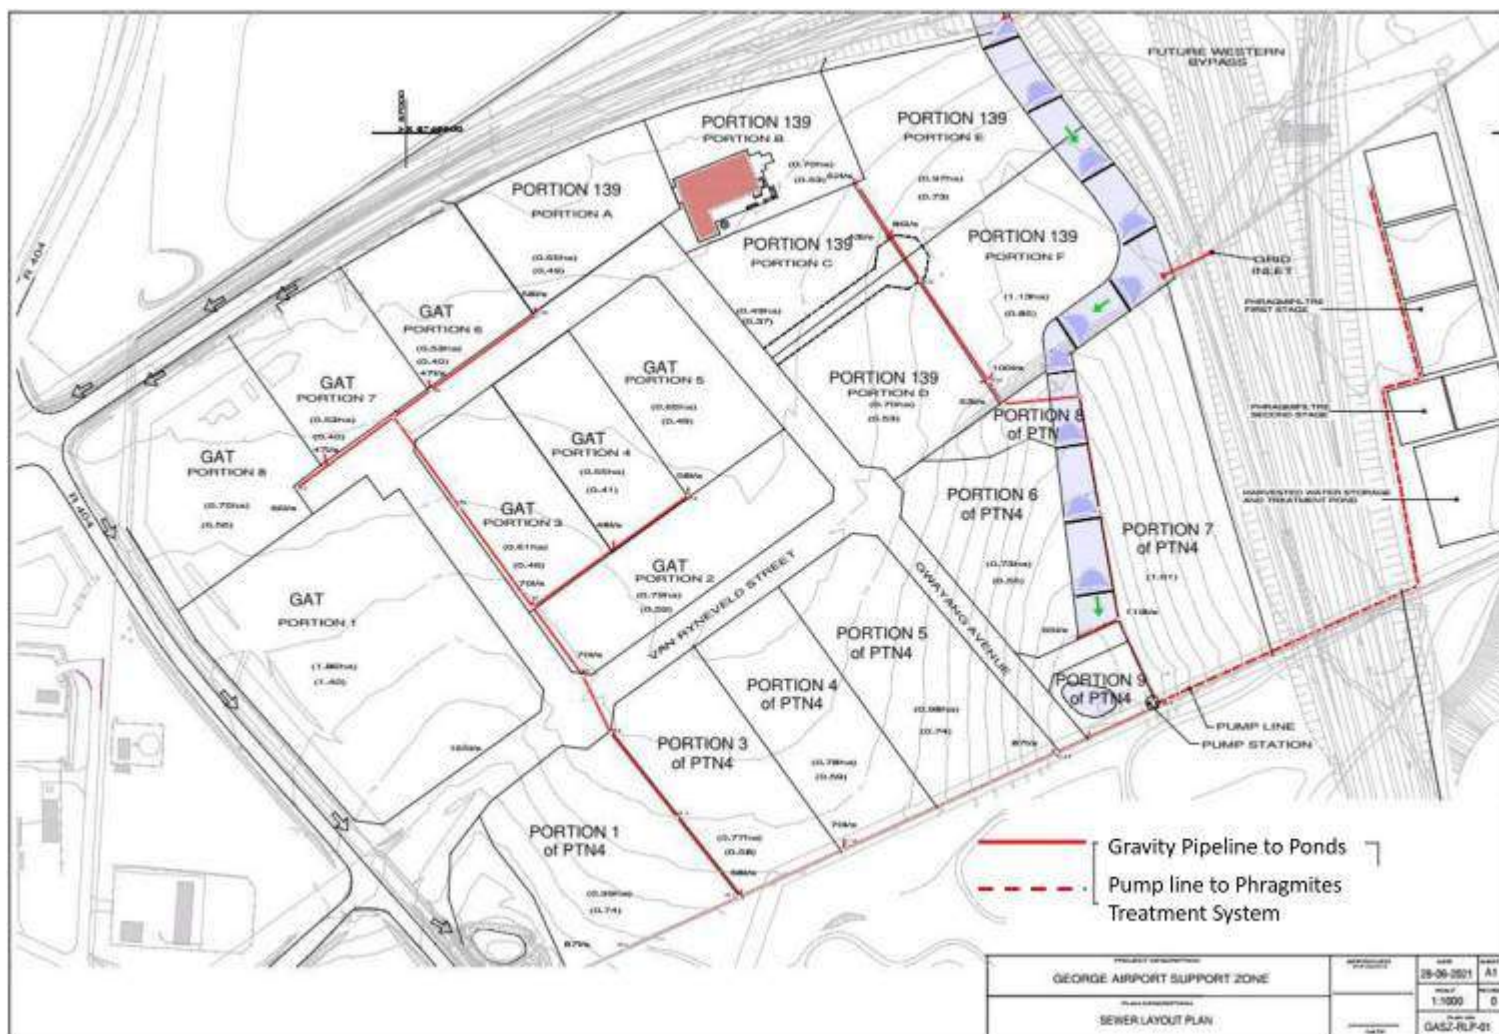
Sewer Layout Plan for the ASZ (ICE, 2022).
